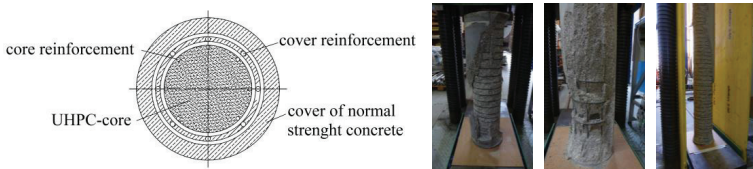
Schematic cross section of UHPC-NSC composite column (left) and typical failures (right)
